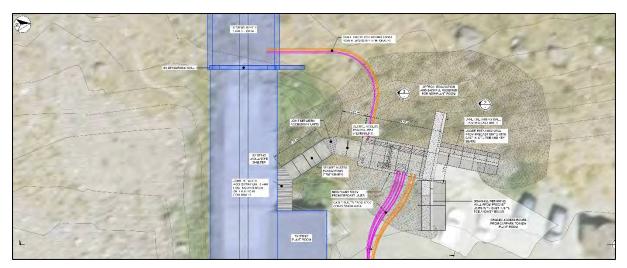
Design drawing of Equipment Building showing proposed plan layout (not to scale).58
